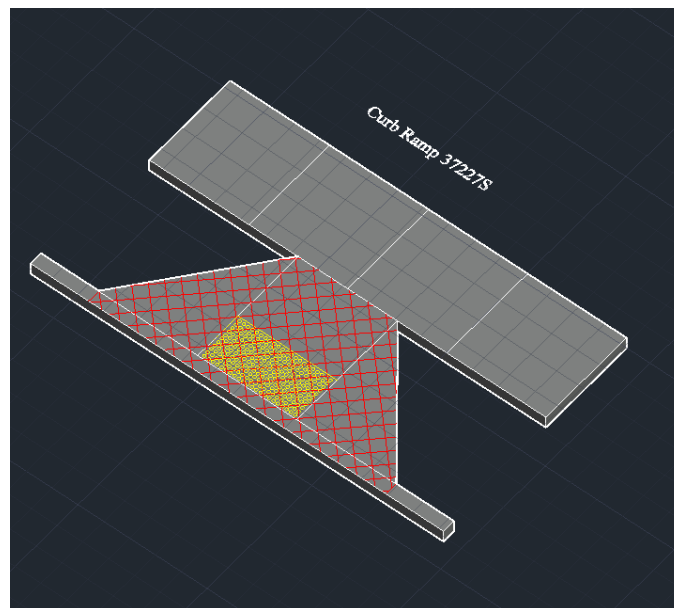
Proposed AutoCAD model of Curb Ramp i at Intersection I.
